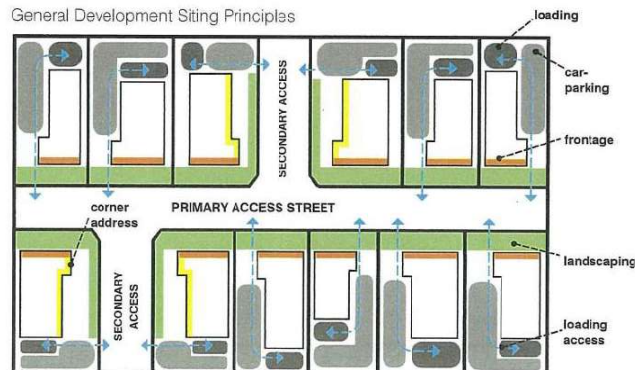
Development Siting - Building orientation, lot design & site coverage Plan
